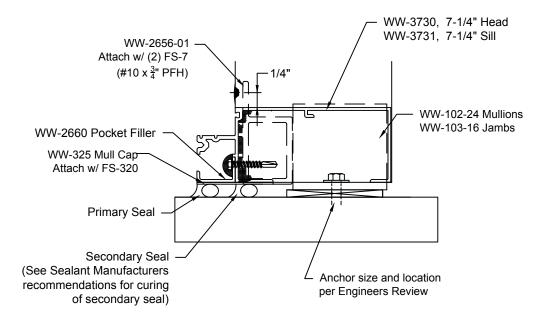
Dual Seal Sill Detail (Head Similar)
